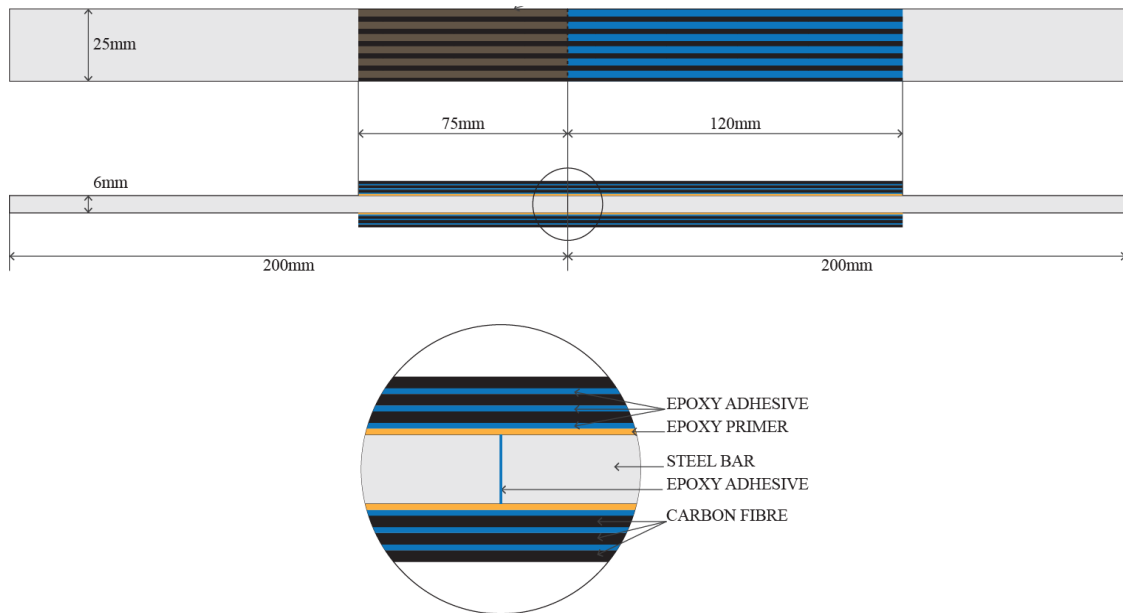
Bond configuration of typical CFRP-steel double strap joint
